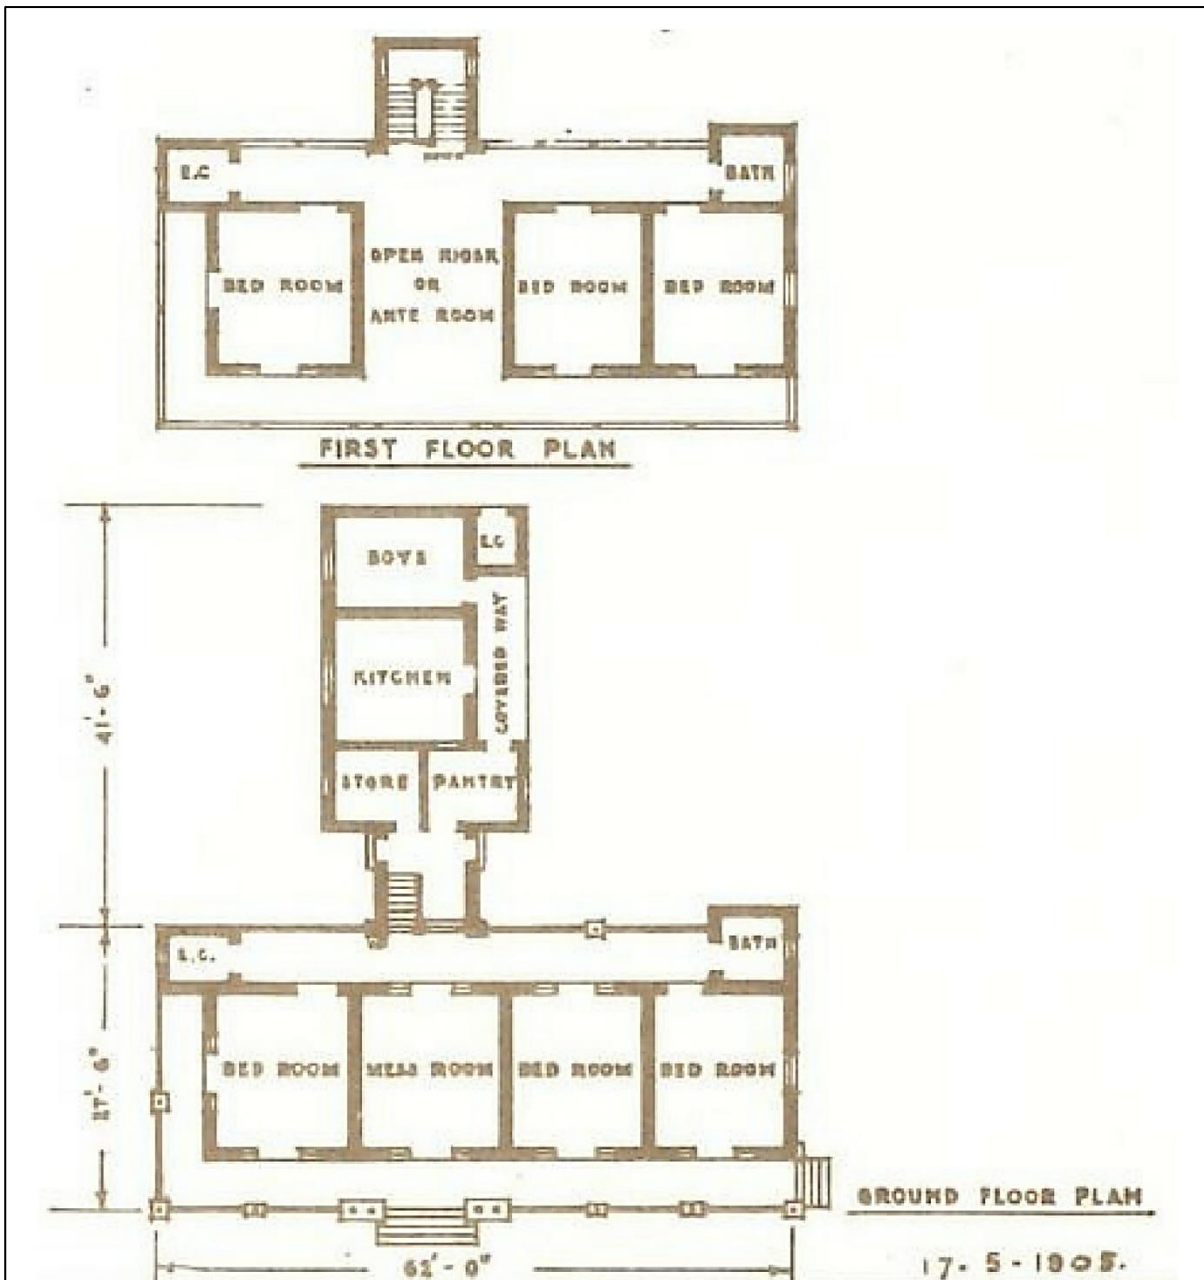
An example of the PWD rest house floor plan; source: Akinsemoyin & Vaughan-Richards (1977).
